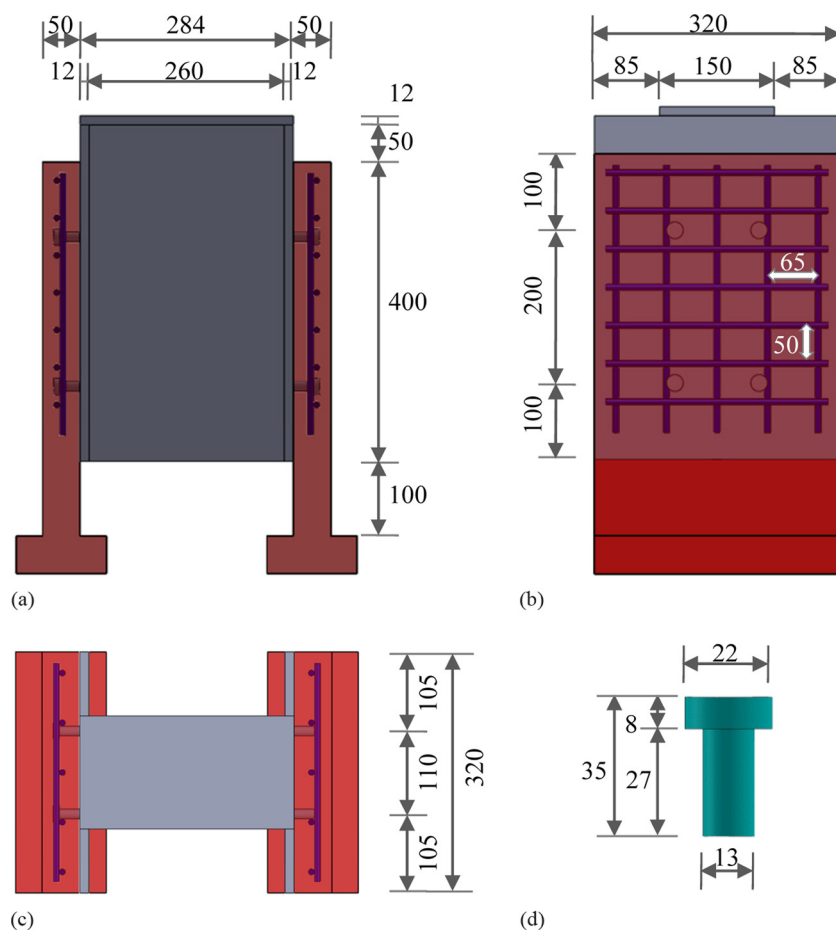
Push-out specimens (units: mm): (a) front view; (b) side view; (c) top view; (d) dimensions of headed stud
